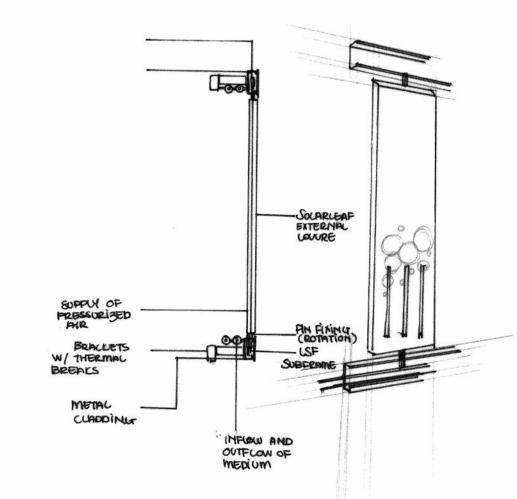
Biopanel shading detail sketch (Author, 2021)
